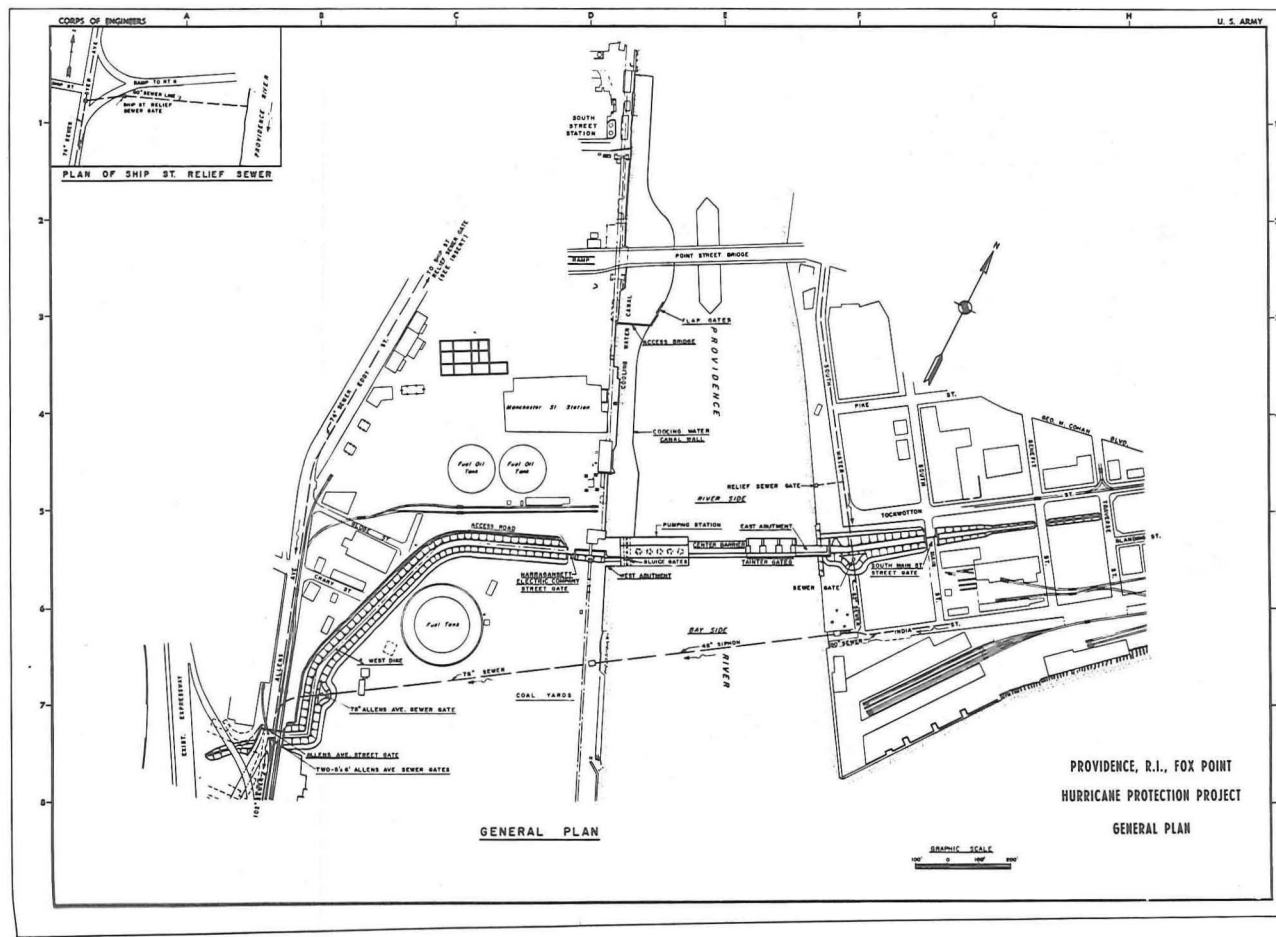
Providence, R. I. - Fox Point Hurricane Protection Project General Plan
